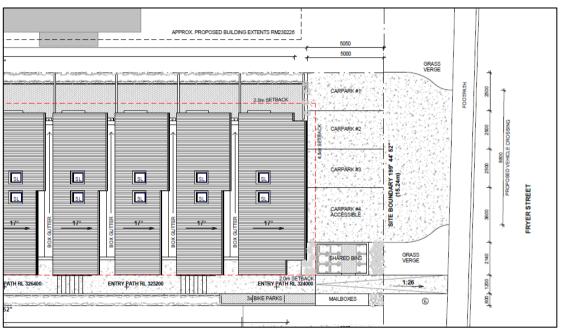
Site plan showing eastern side of site (car parks within setback and shared bins storage area)
